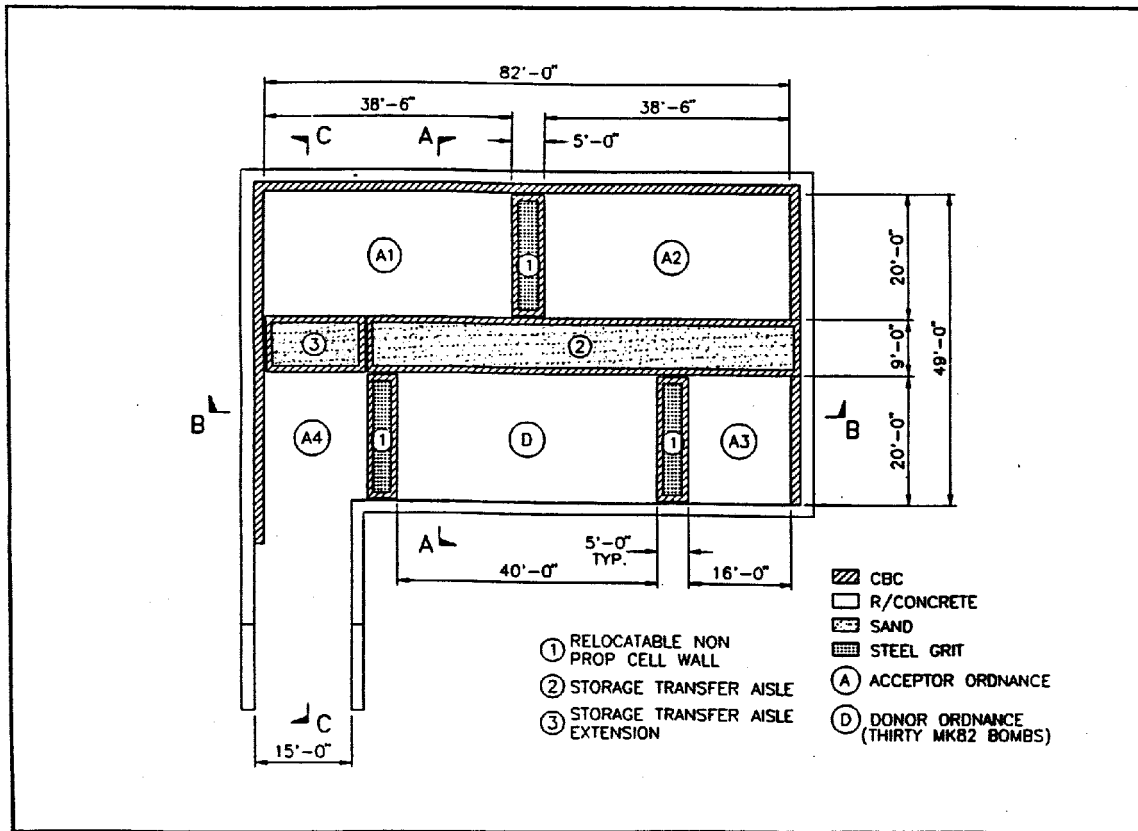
Certification Test Structure No. 1: Floor Plan.
